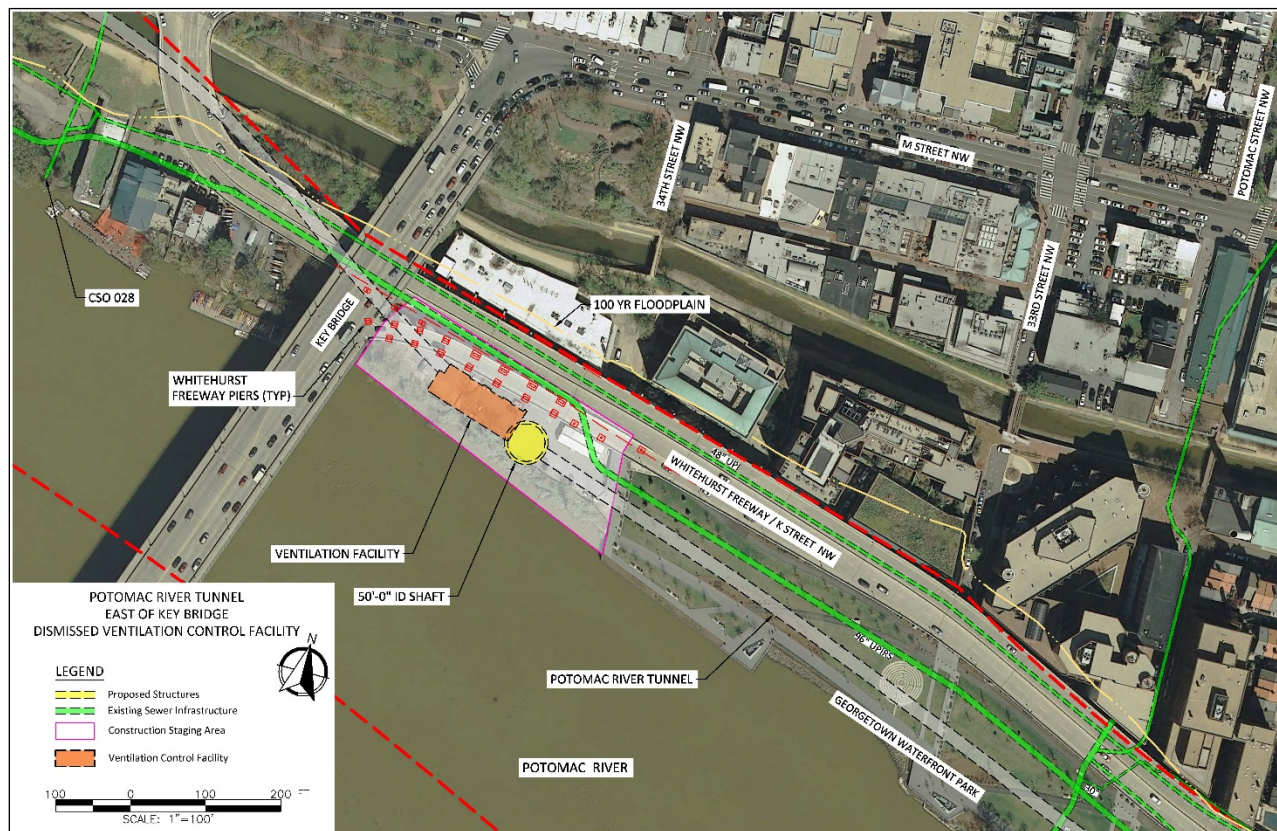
Dismissed Ventilation Control Facility Site Option East of Key Bridge
